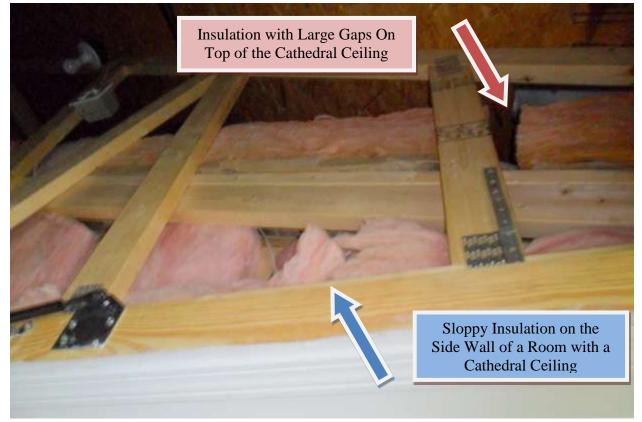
Poorly Installed Ceiling and Attic Wall Insulation
